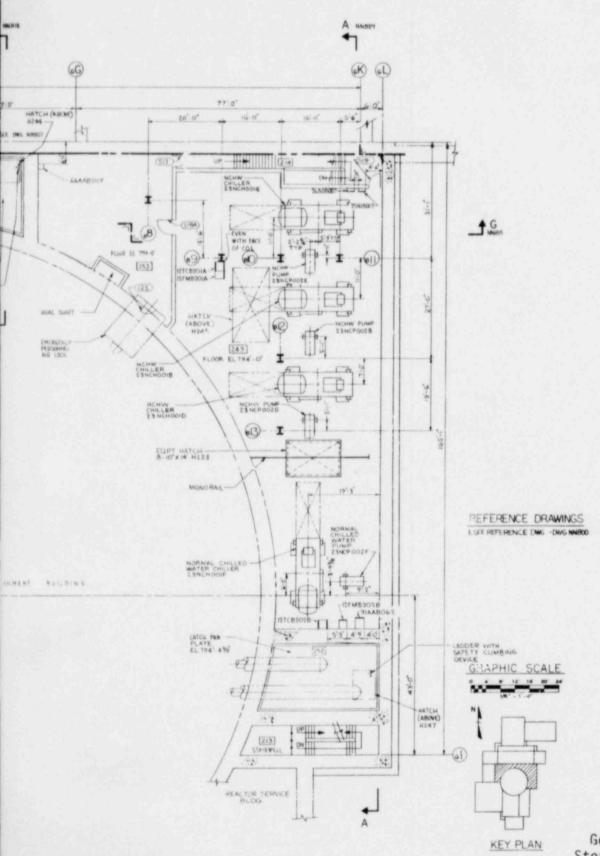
General Arrangement Steam Generator Building Plan El. 794'-0"
